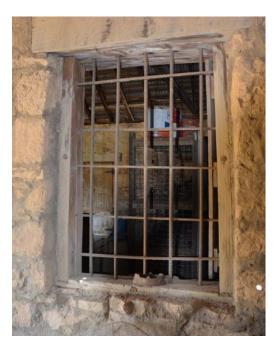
Detail of a typical window with timbe lintels and frames and iron bars.
